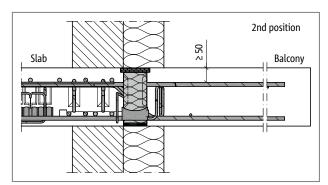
Schöck Isokorb® T type C: Section 2nd position; connection with thermal insulation composite system (TICS)
